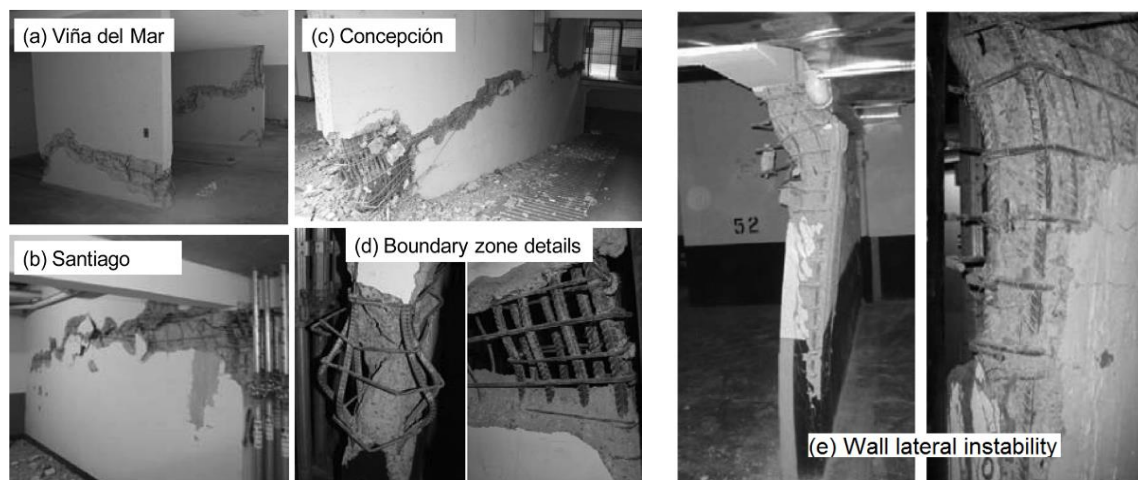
Typical wall damage in 2010 Chile earthquake (Wallace 2012)
